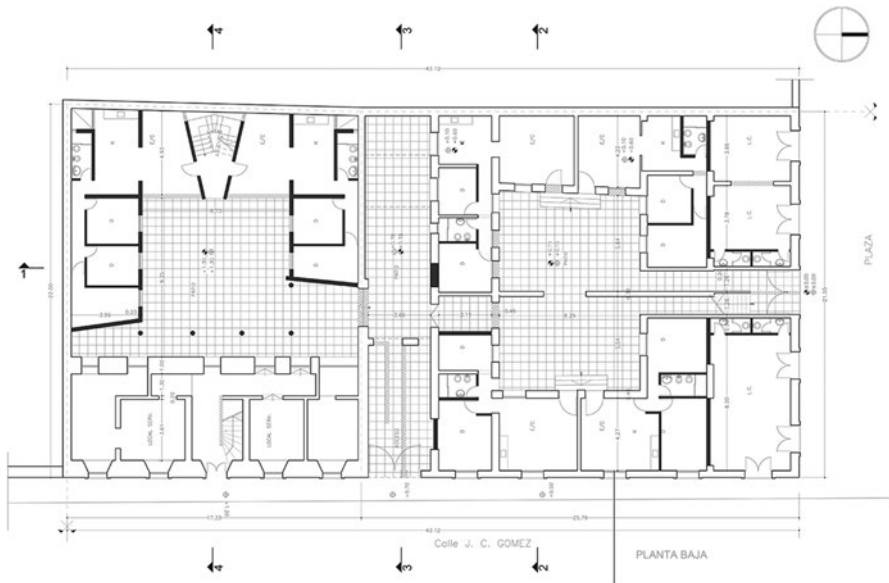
COVICIVI 2's ground floor plan. Source: Architect Raúl Vallés Collection
